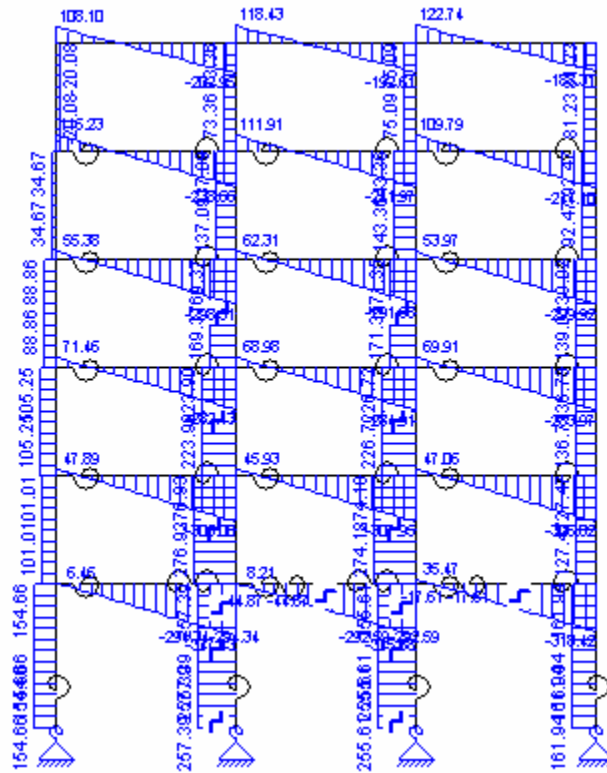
Shear diagram in the transverse frame, with modified stiffness columns beams connections, considering seismic actions
